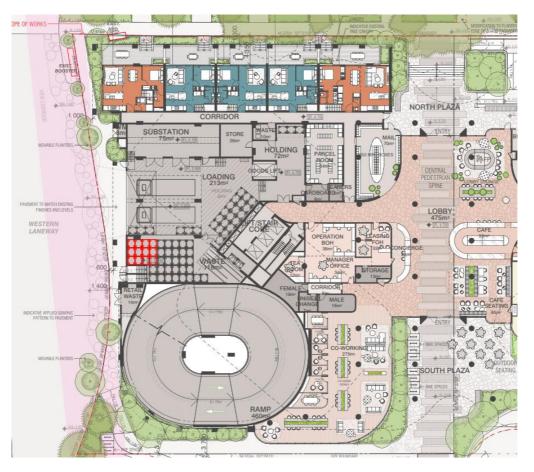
Ground floor plan extract - showing indicative applied graphic pattern to pavement
